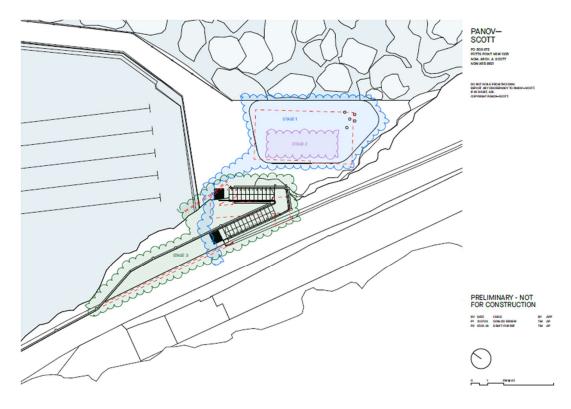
Site and staging plan for the proposed upgrades (Source: Panov-Scott, 2025)
